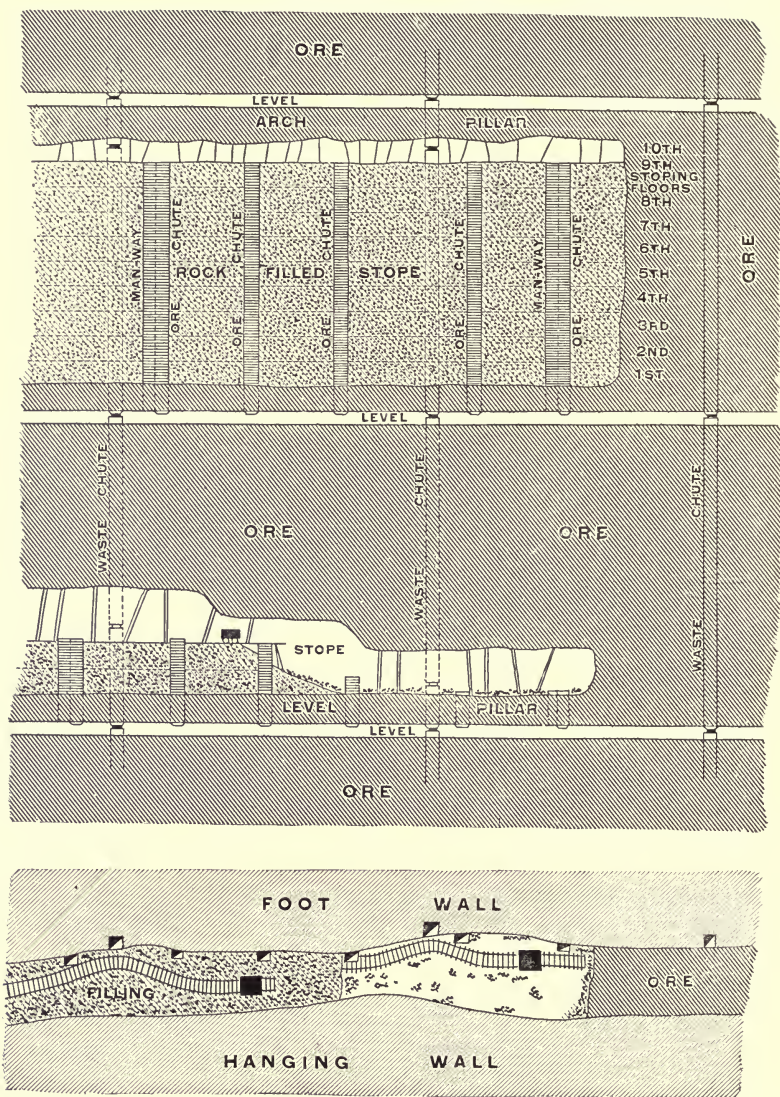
Elevation and Plan of Stopes. Back-filling Method.
